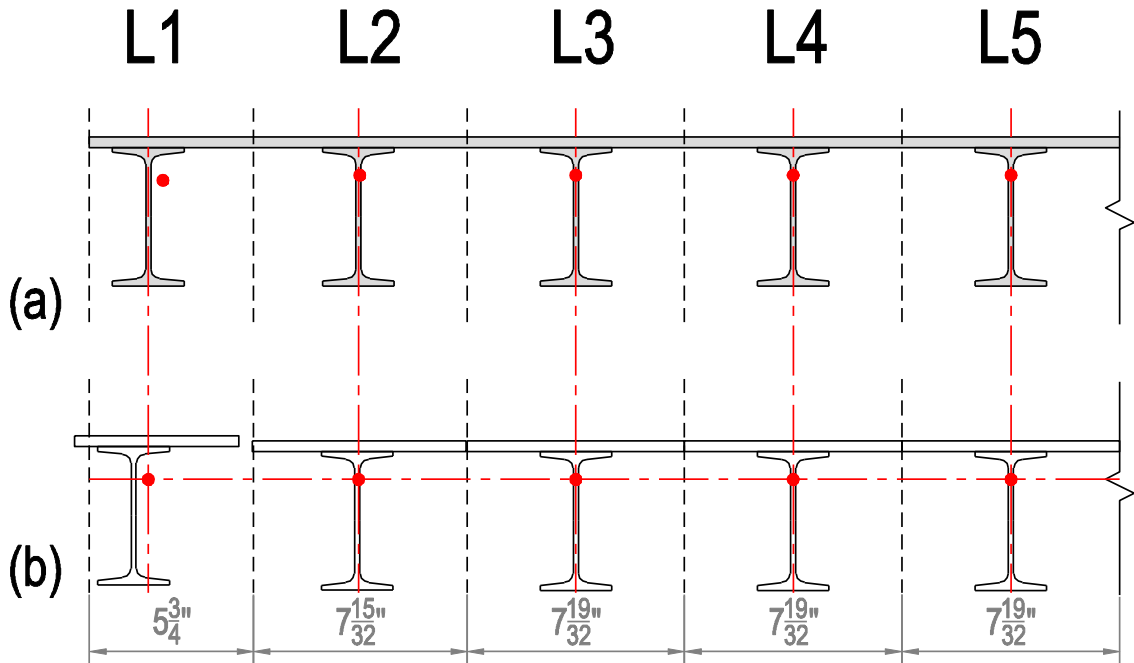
Division of bridge deck into longitudinal members (a) Longitudinal members without cover plate (b) Placement of sections in grillage layout
